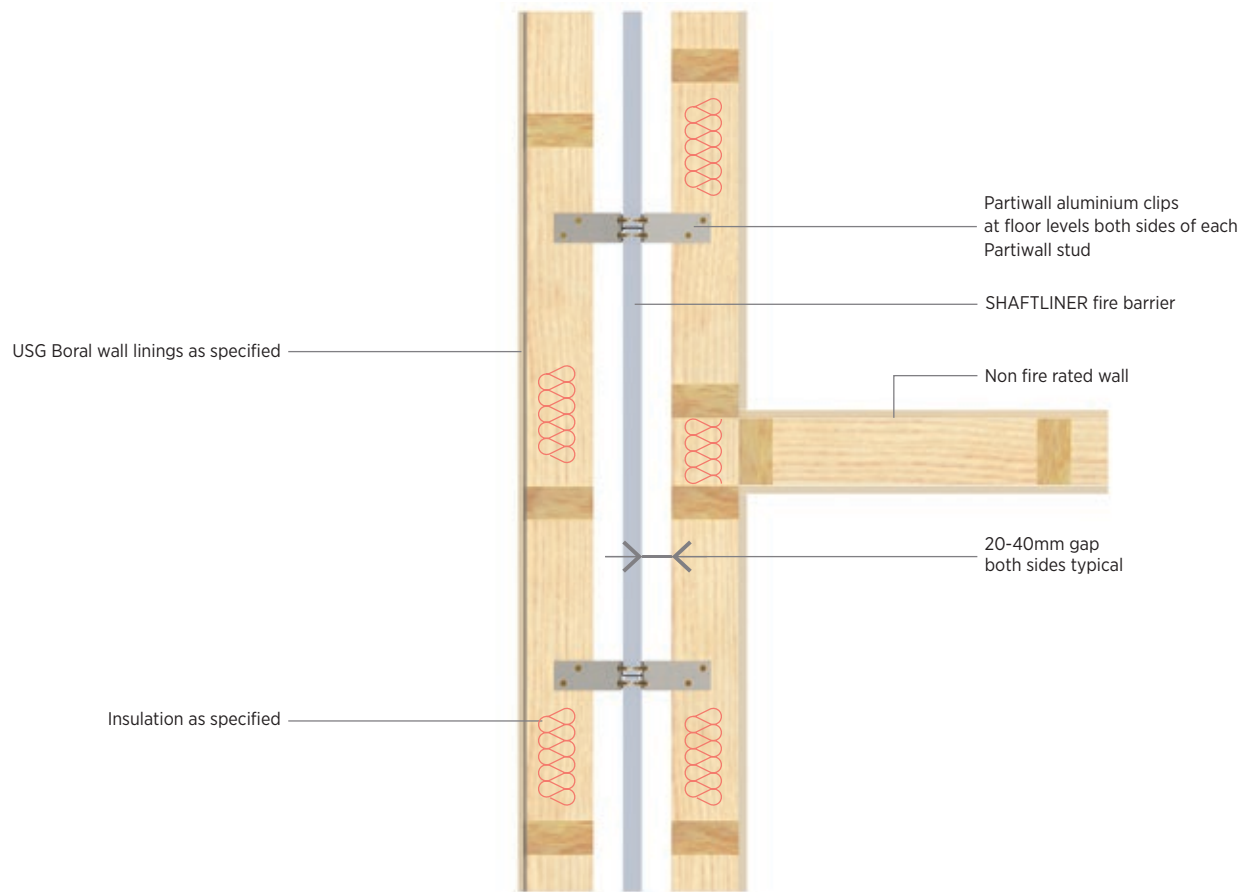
External to Internal Partiwall® Detail - FRL 60/60/60
